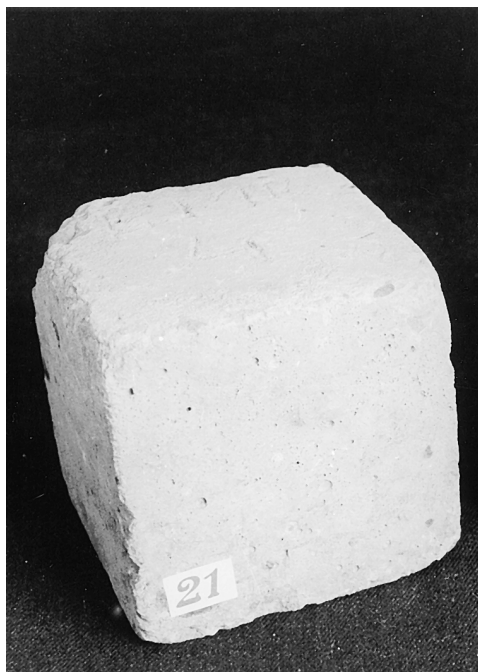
Concrete cube having epoxy-coated MS rebars (80 cycles).
